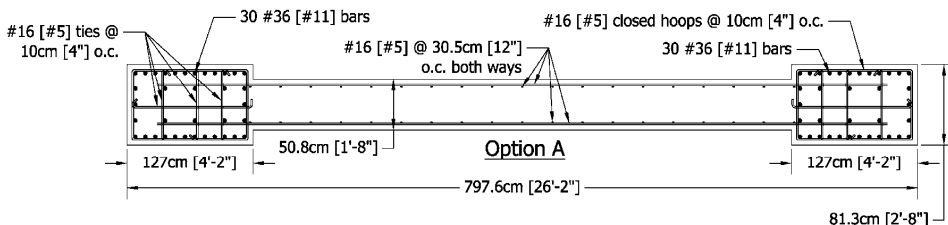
Detailed Plan View of the Shear Wall (redrawn from Nawy 2000)
